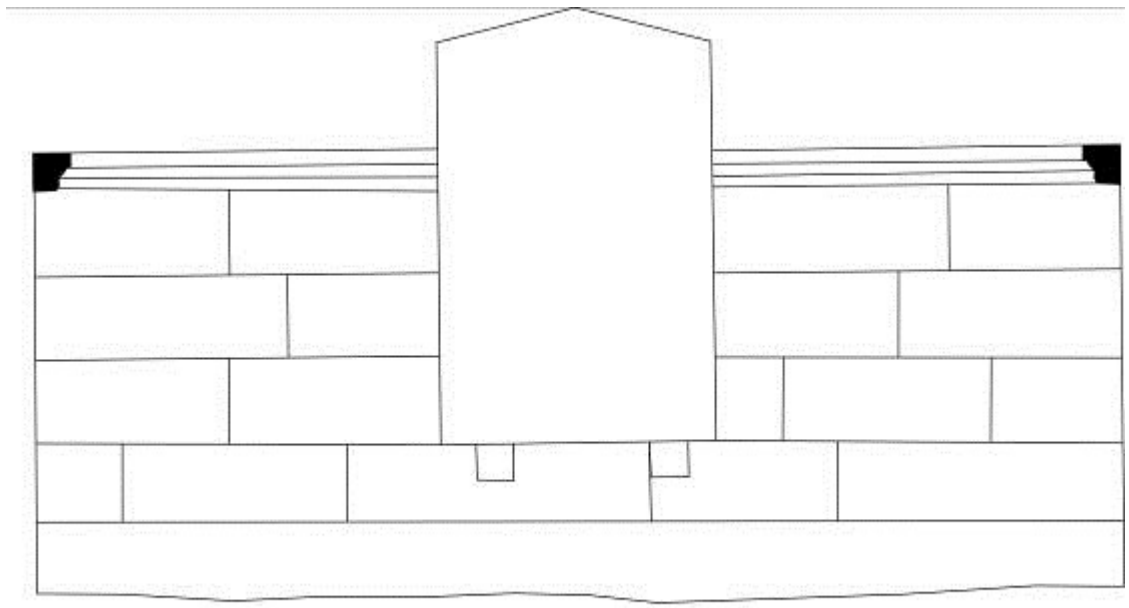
Drawing of west facing internal elevation of burial enclosure Scale 1:40
